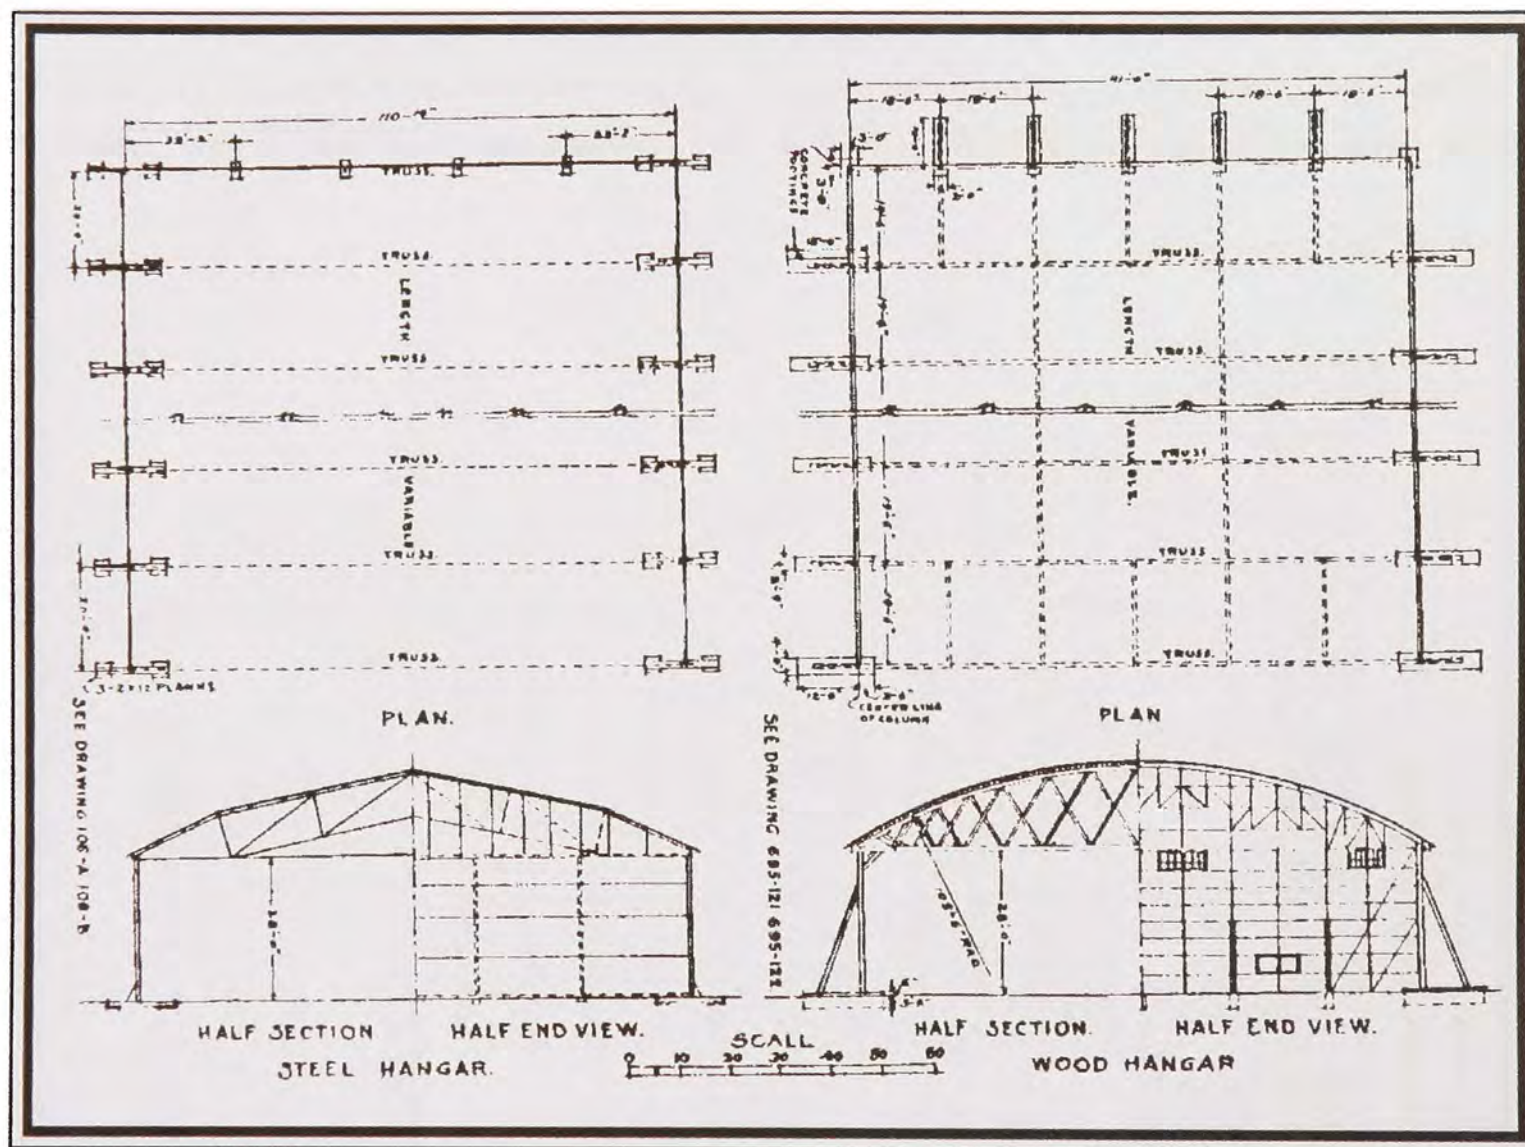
Plan for standard steel and wood hangers, Construction Division of the Army, 1918 (National Archives).
